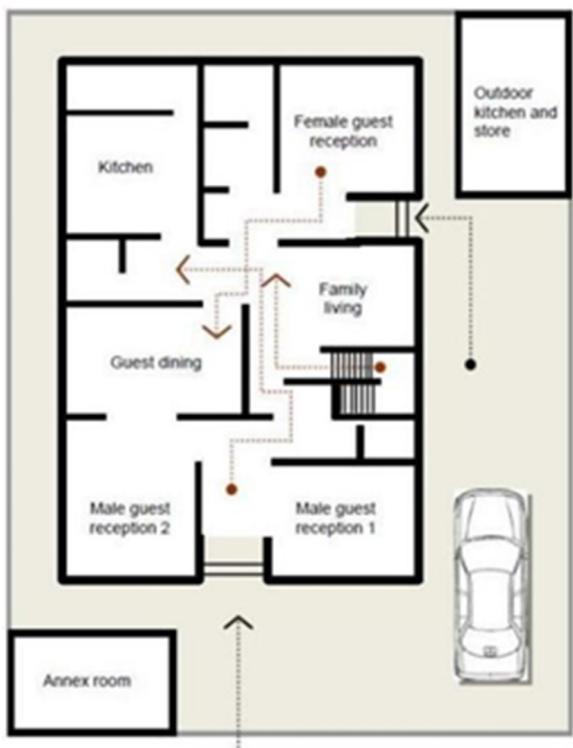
Villa type dwelling: Ground floor plan (Almehrej 2015).
